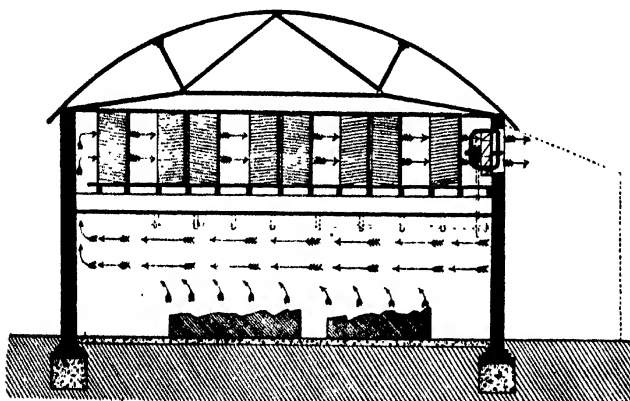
Application of Artificial Withering by means of Waste Heat to an Ordinary Tea House with a Curved Roof (transverse section).
